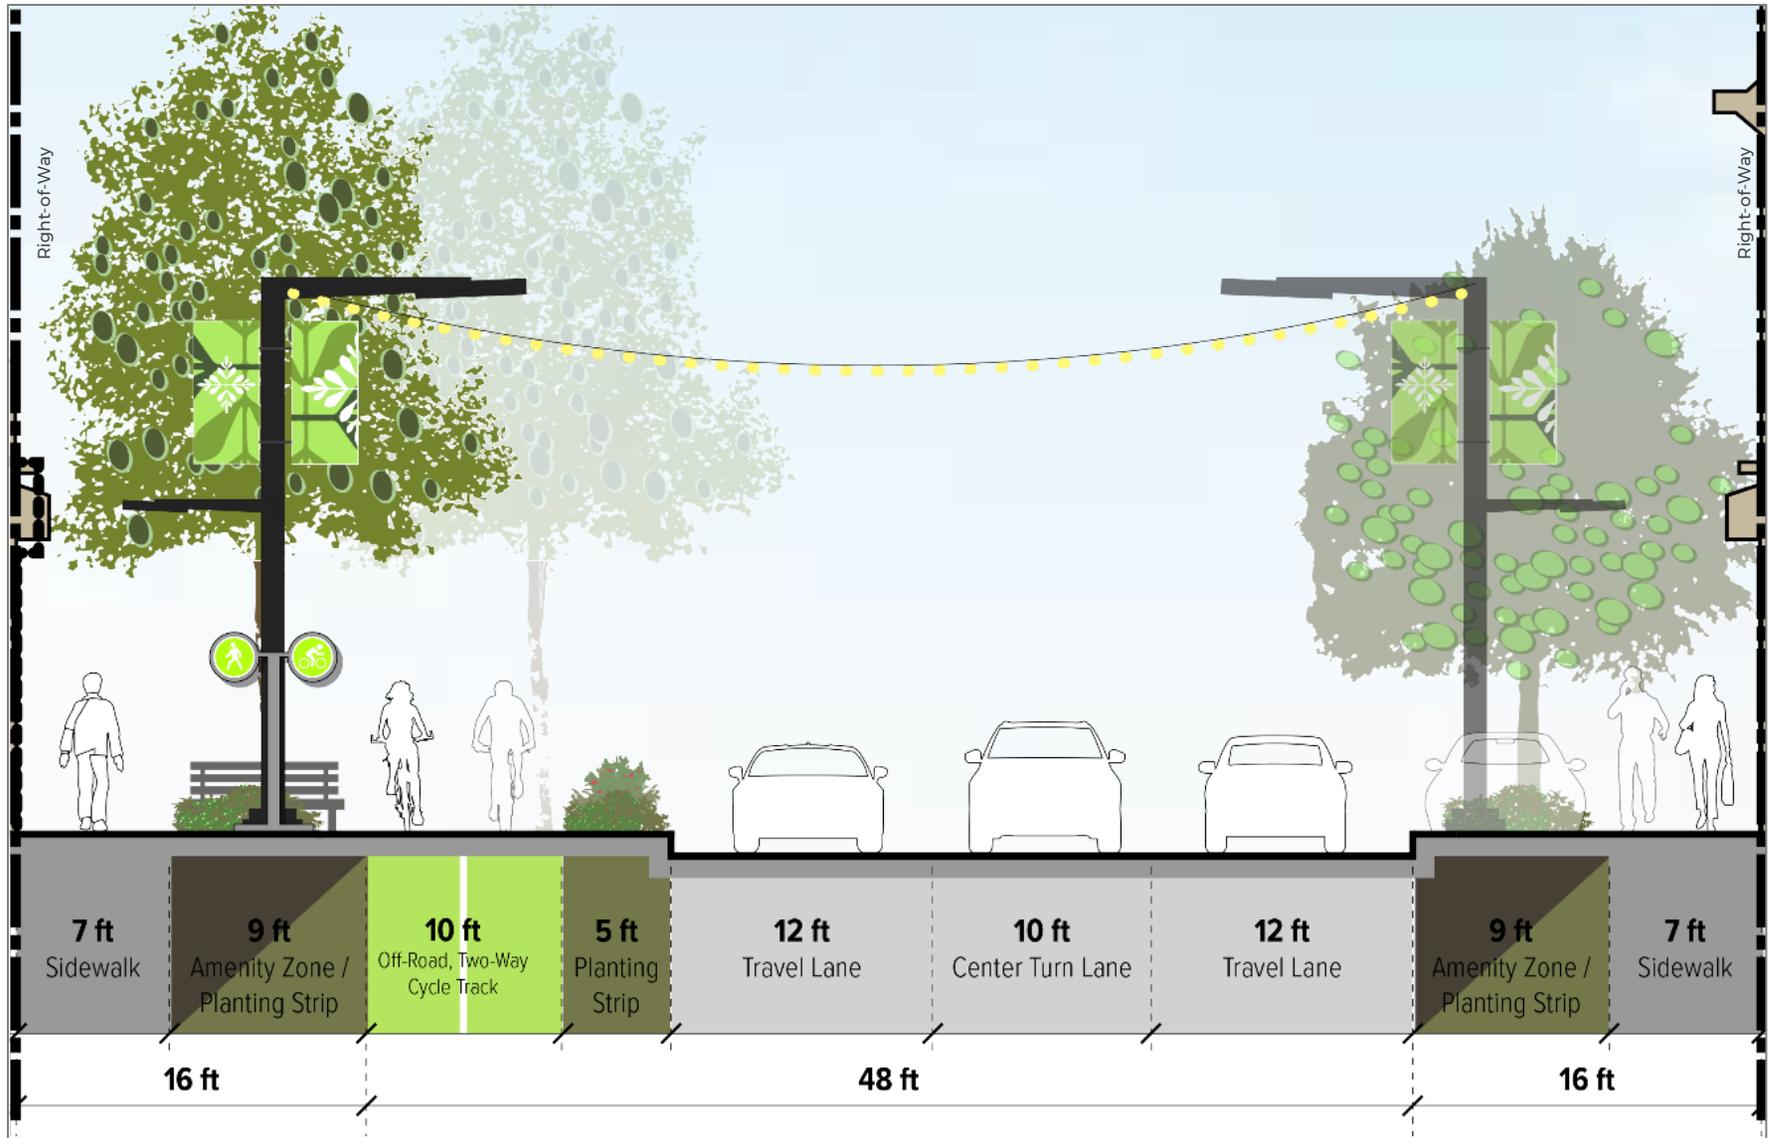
Proposed cross-section of Lee Road between Scottsdale & Lomond, looking north
